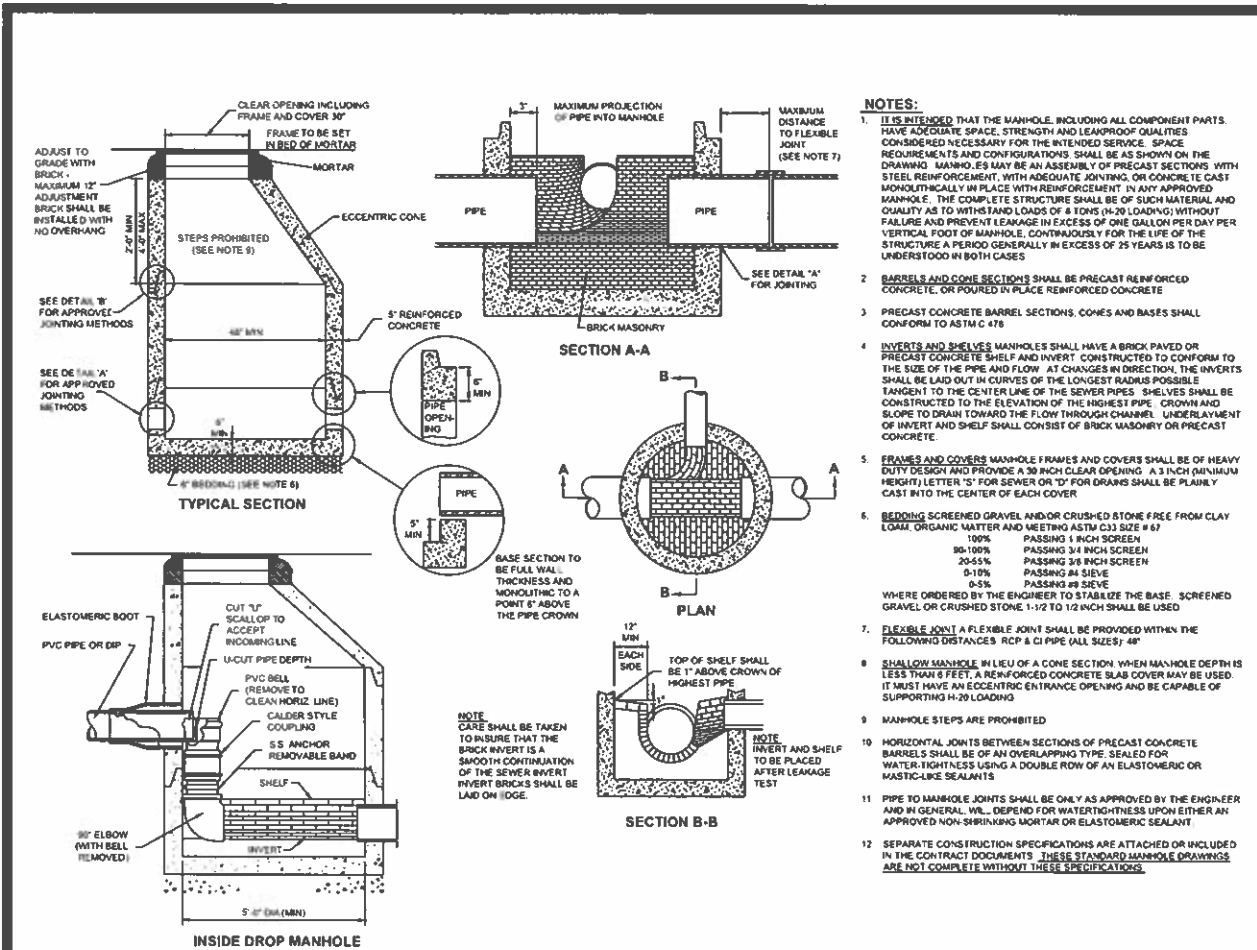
DETAIL SHEET - GENERAL SITE (MAP 'E', LOT 8)
